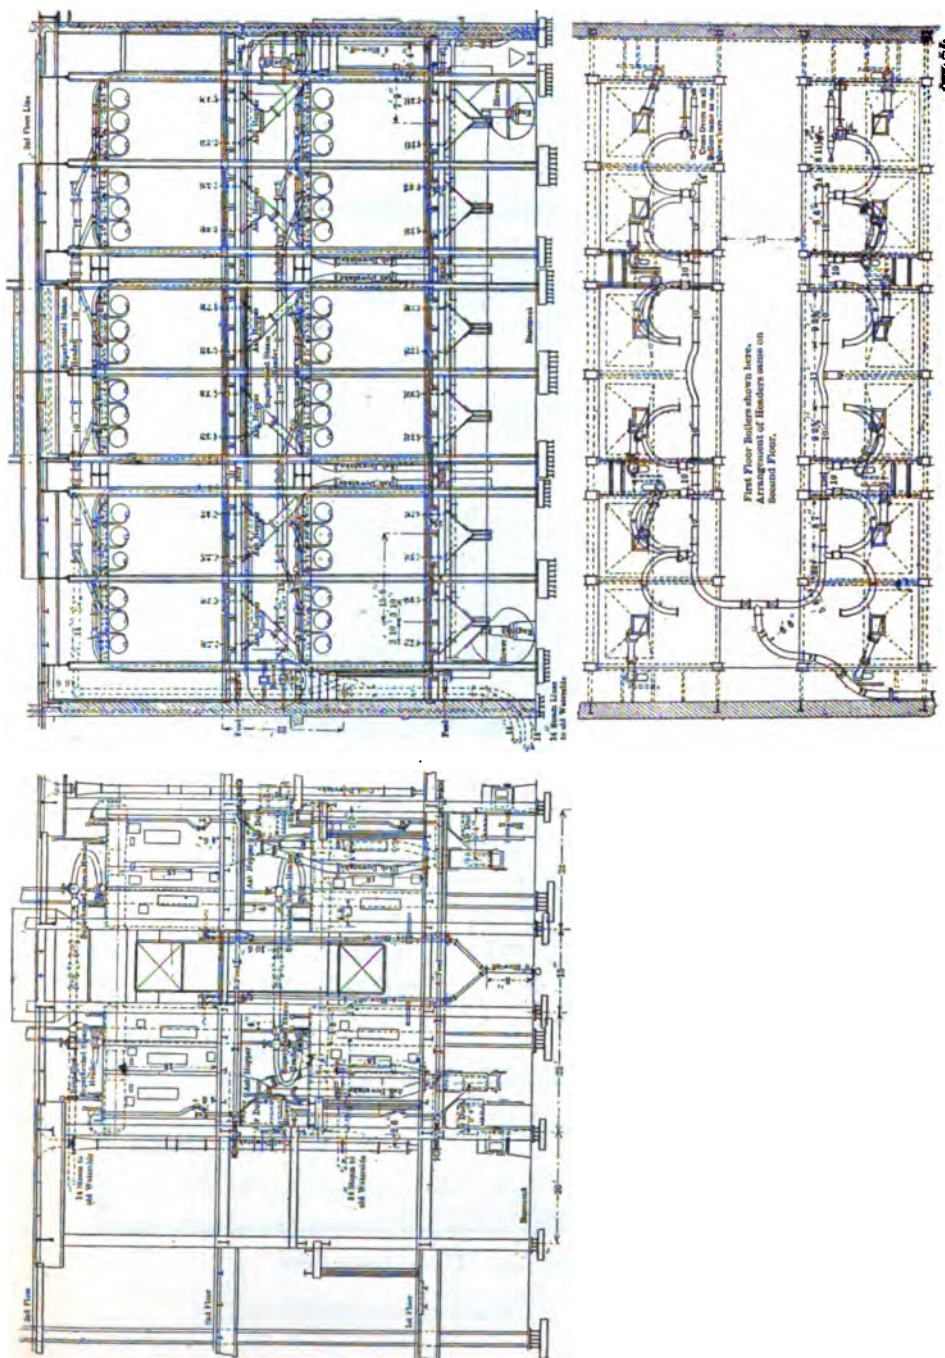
A. New York Edison Co.'s Waterside Station No. 2 : Piping Detail. (See also pp. 444, 455, 491.)
